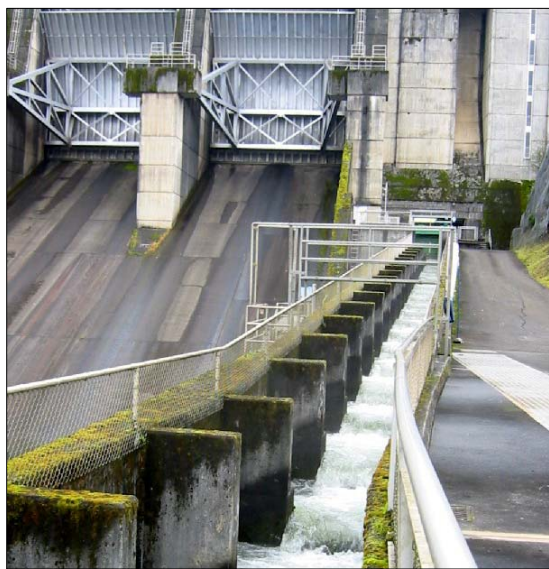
Foster Fish Facility. Fish ladder leading to the trap-and-fish elevator.
